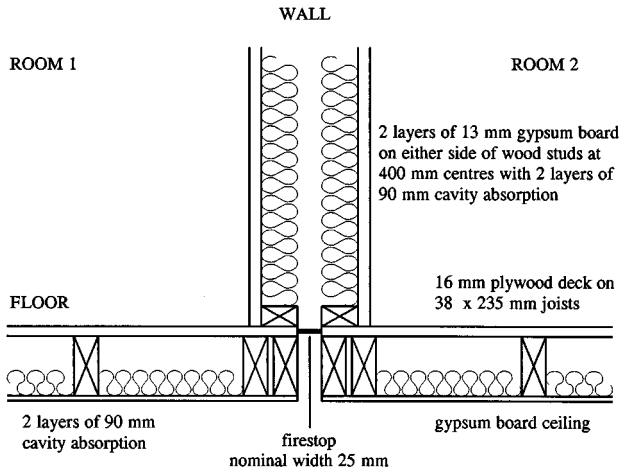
Section through a double wall resting on a wood floor with a firestop to prevent the passage of fire and smoke.
